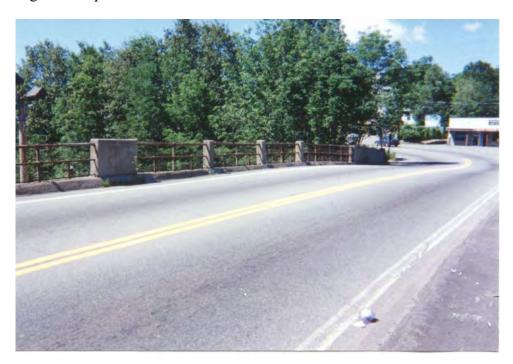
Looking southeast at the west span roadway over NJ TRANSIT Montclair-Boonton Line. Note: Bridge deck geometry has an inadequate to curb-to-curb width of 29 feet 7 inches (present design standards require 34-foot minimum).
